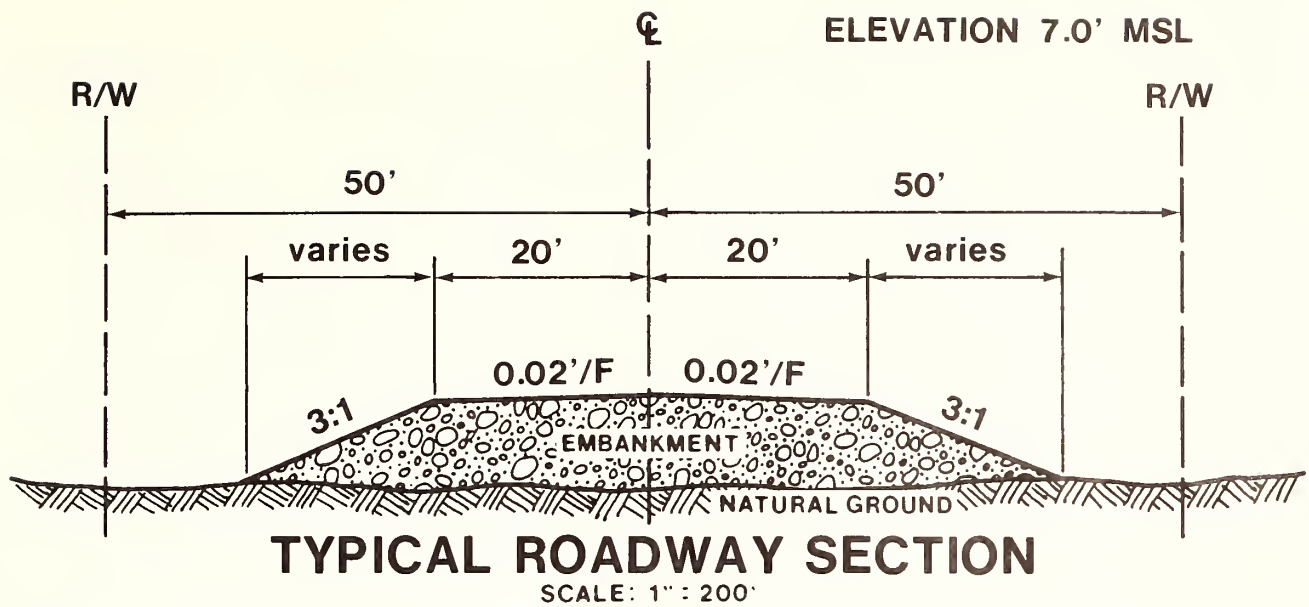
Typical road cross sections at the Port Fourchon facility.
